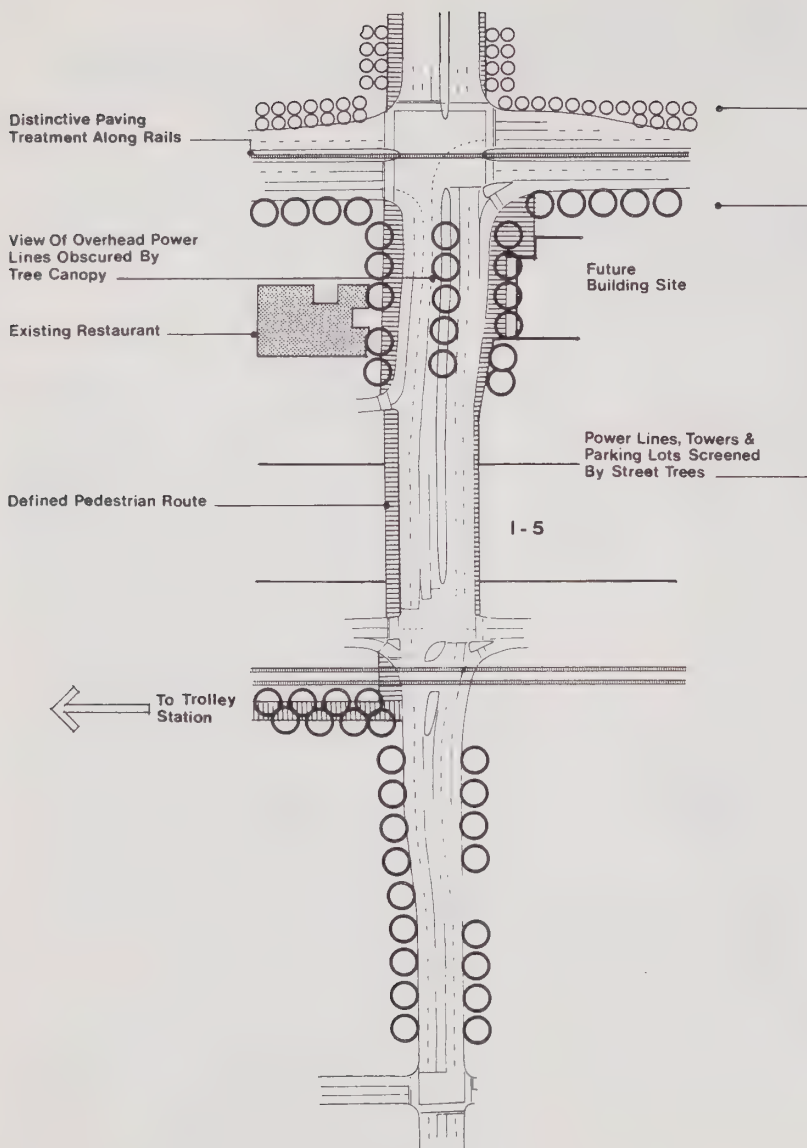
LANDSCAPE CONCEPT AT E-STREET GATEWAY
